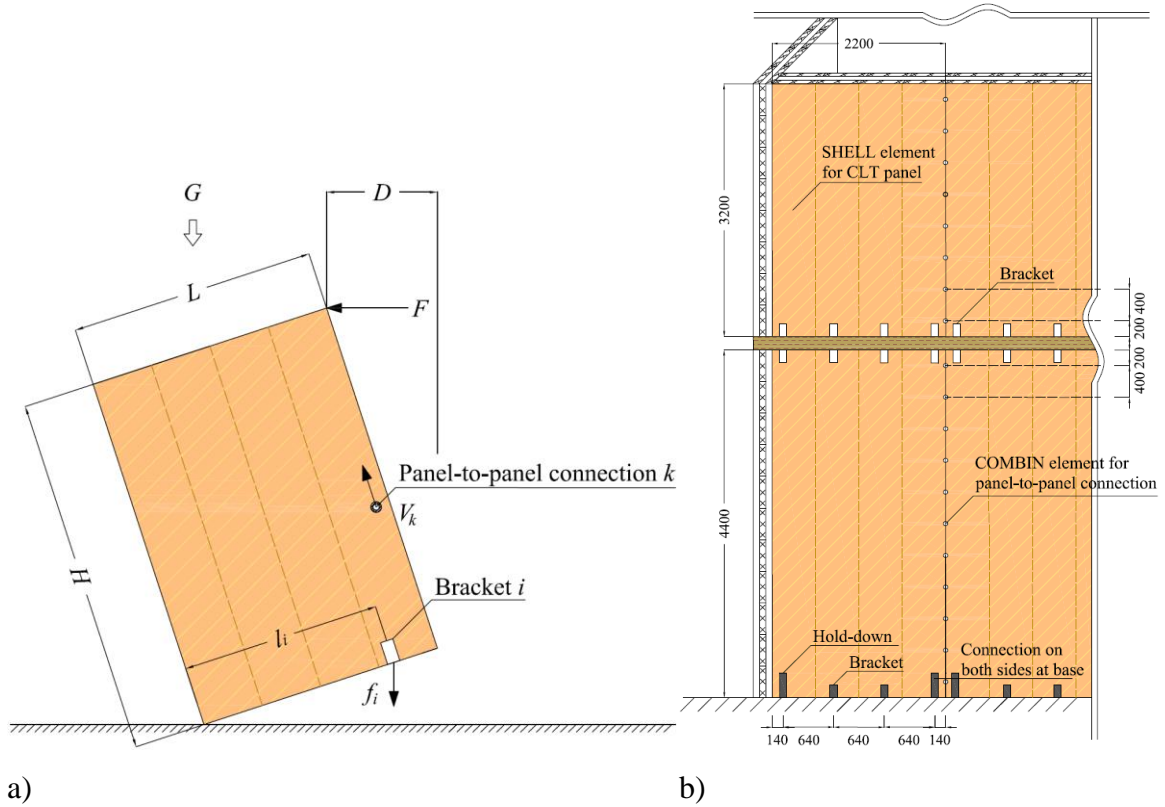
Illustrations of connections: a) simplified kinematics model of CLT wall panel subjected to horizontal load; b) illustration of connection system (dimension in mm).
